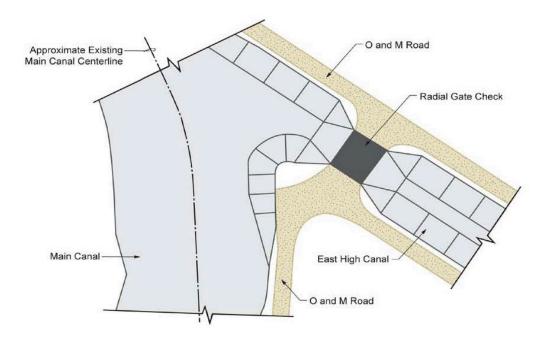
East High Canal headworks structure – conceptual site plan.
